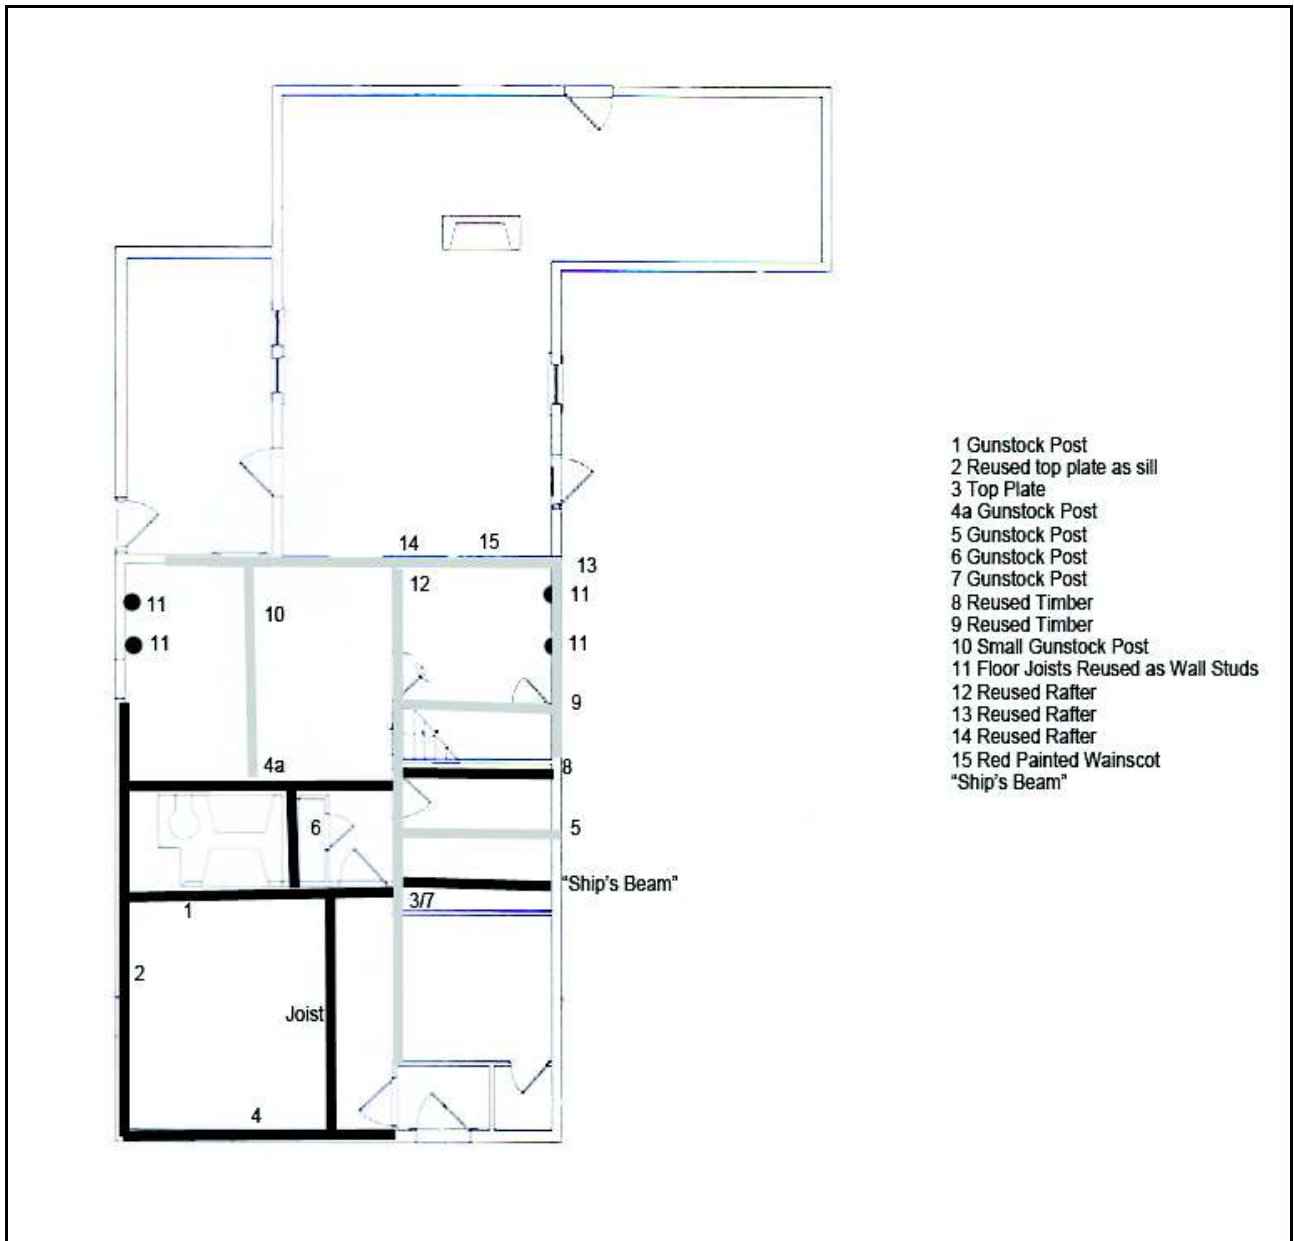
Reused timber locations discussed in test (black are first floor timbers, gray are second floor timbers)
